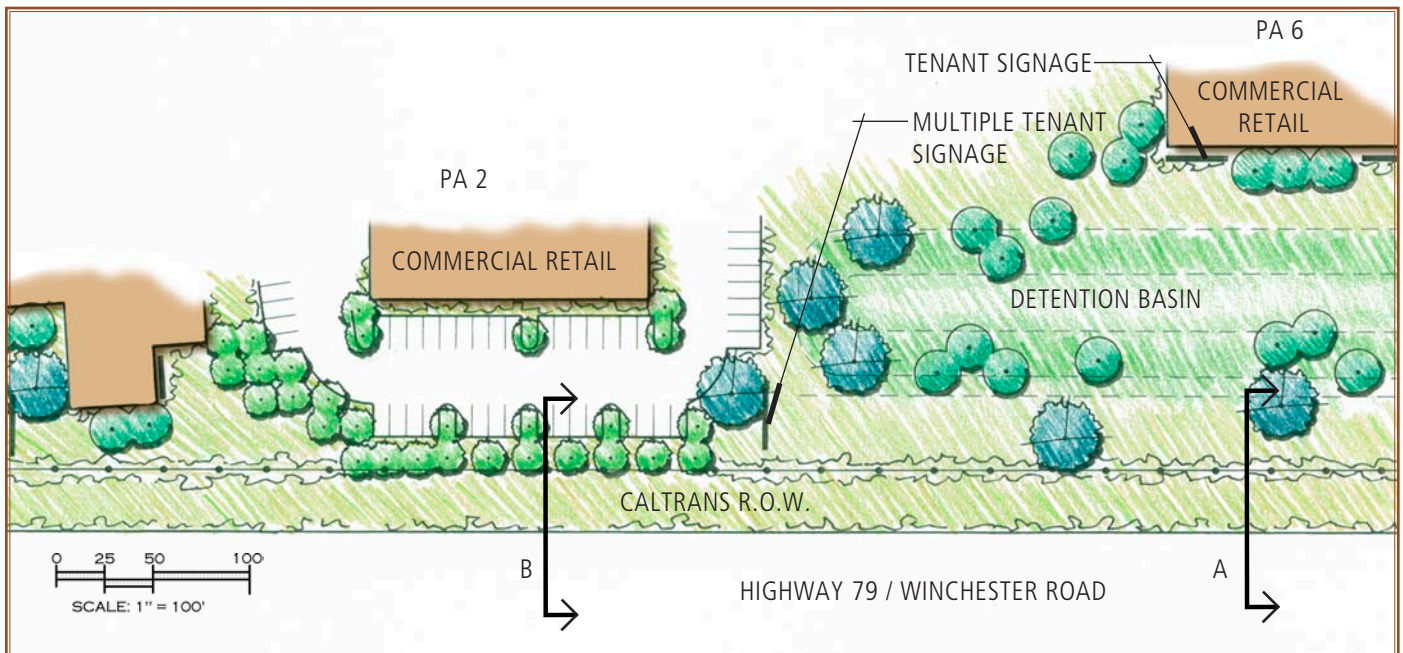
A: Highway 79 / Winchester Road Streetscape - Plan View
